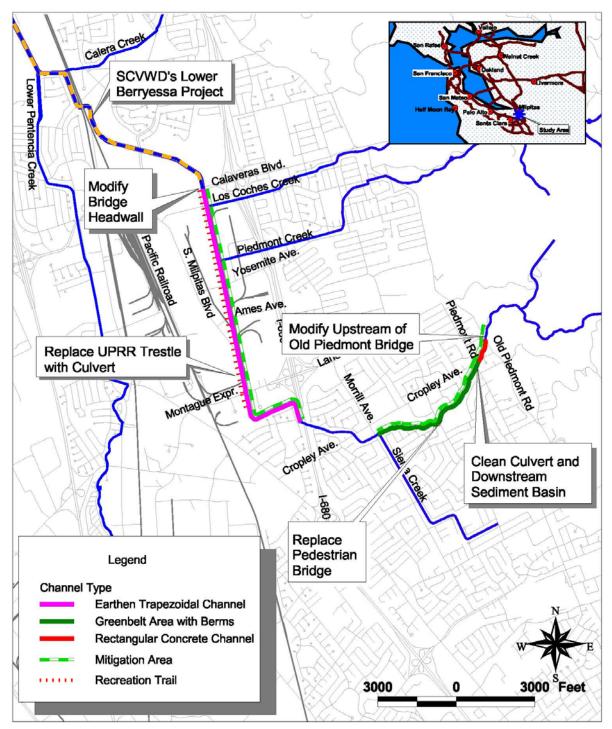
Alternative 2 – Earthen-Trapezoidal Channel with Mitigation (Old Piedmont Road to Calaveras Boulevard)
